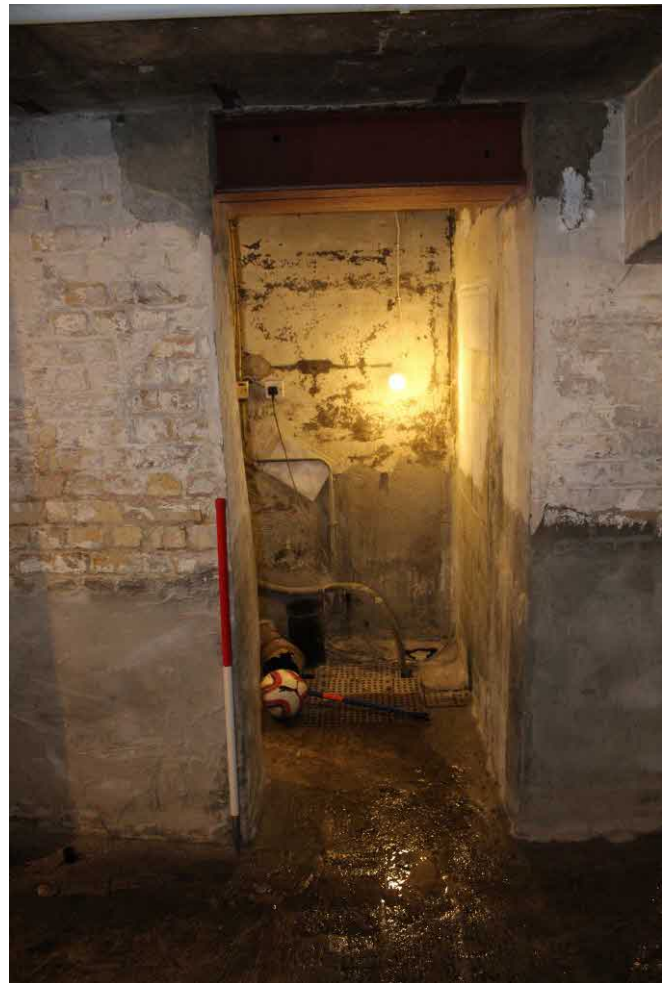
Entranceway between Room 3 and 4. Sump visible in background. Photograph taken facing east.
